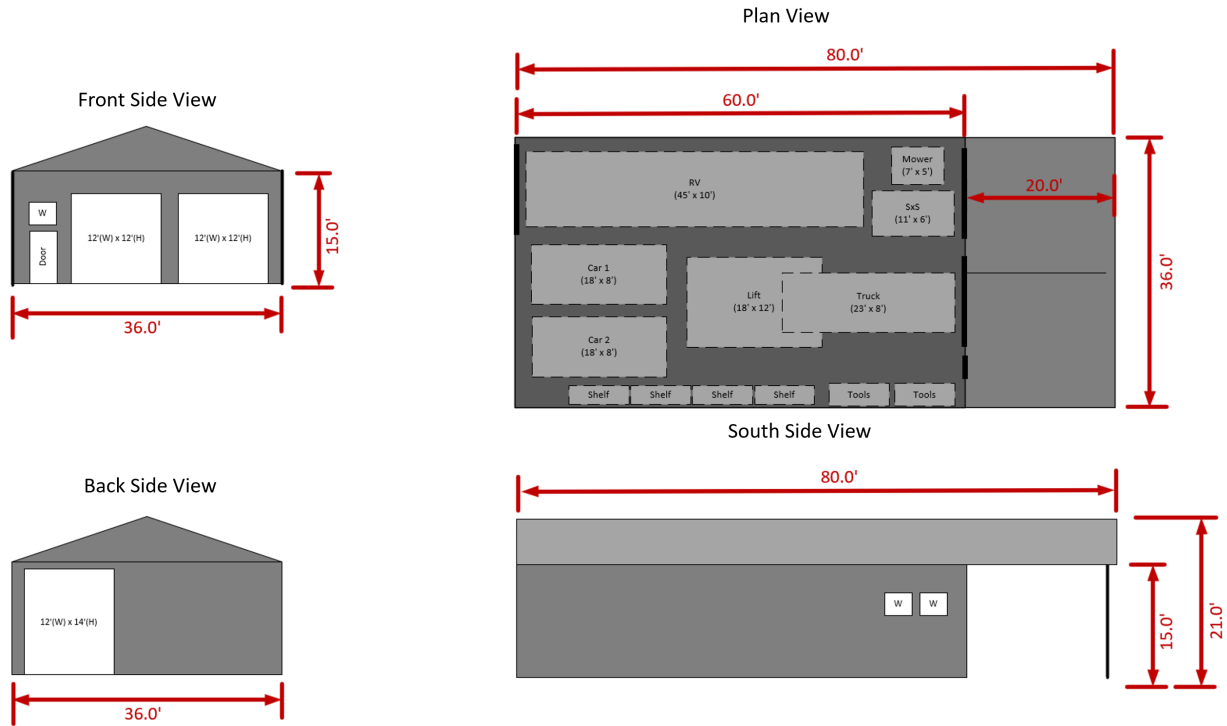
84 Secretariat Ln. Workshop Dimensions
